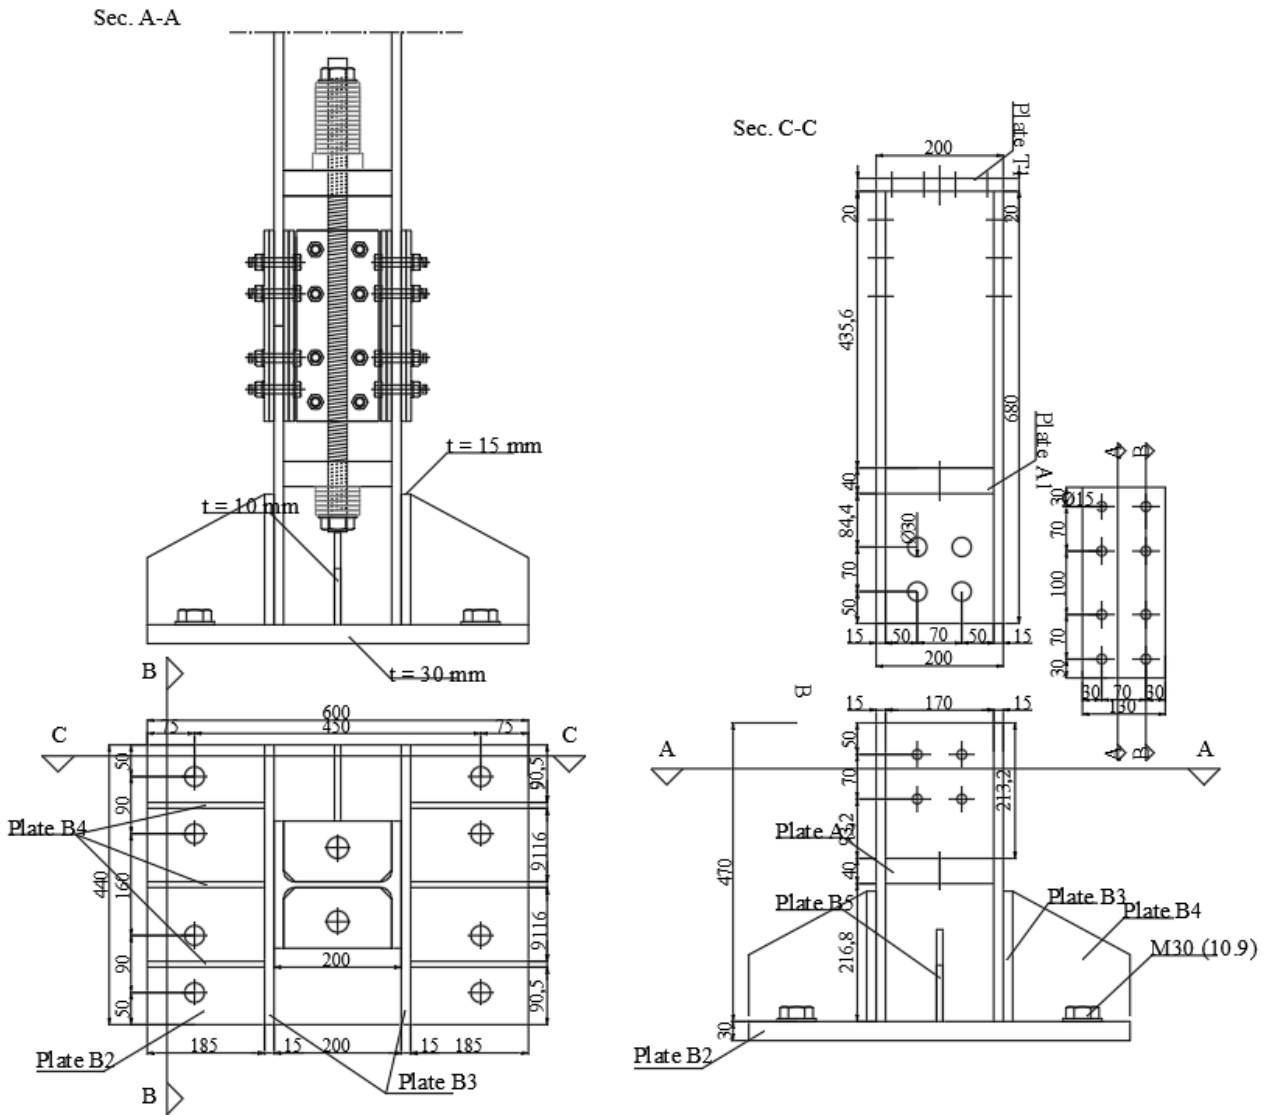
Assembly of the SC-CB (dimensions in mm)
